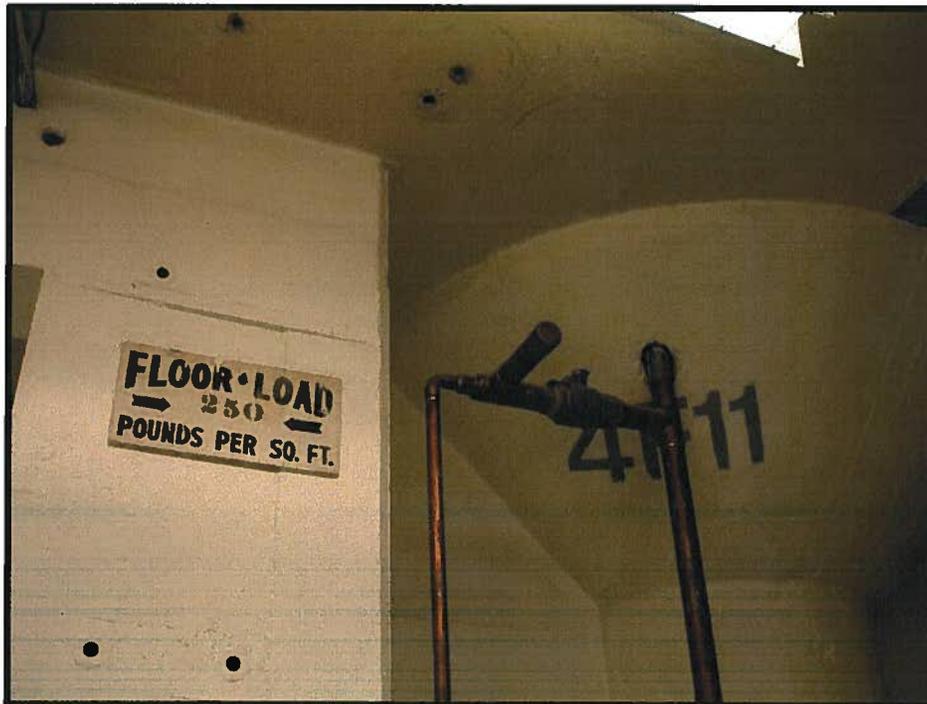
Interior detail, showing floor load sign and concrete pillars, 390 Main Street, May 2008. Source: Heather Lee Miller, HRA.
